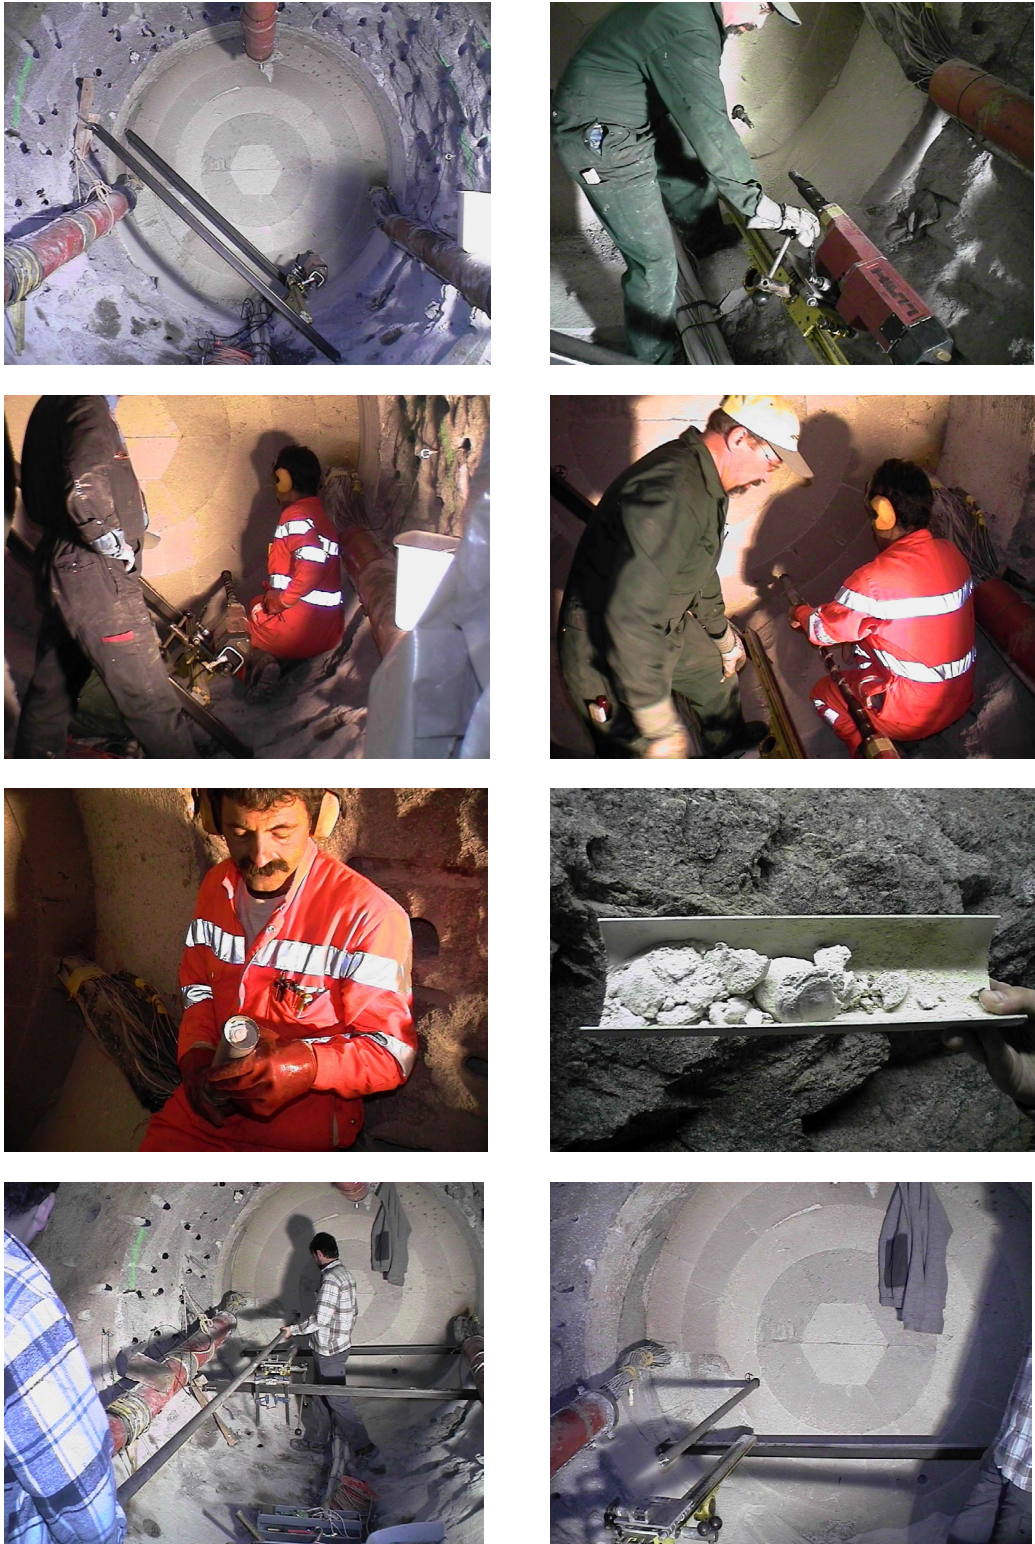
Front end of the bentonite Slice 131 with the two steel grinders and the mounted machine for drilling boreholes in the bentonite: drilling tests performed on 29 May
